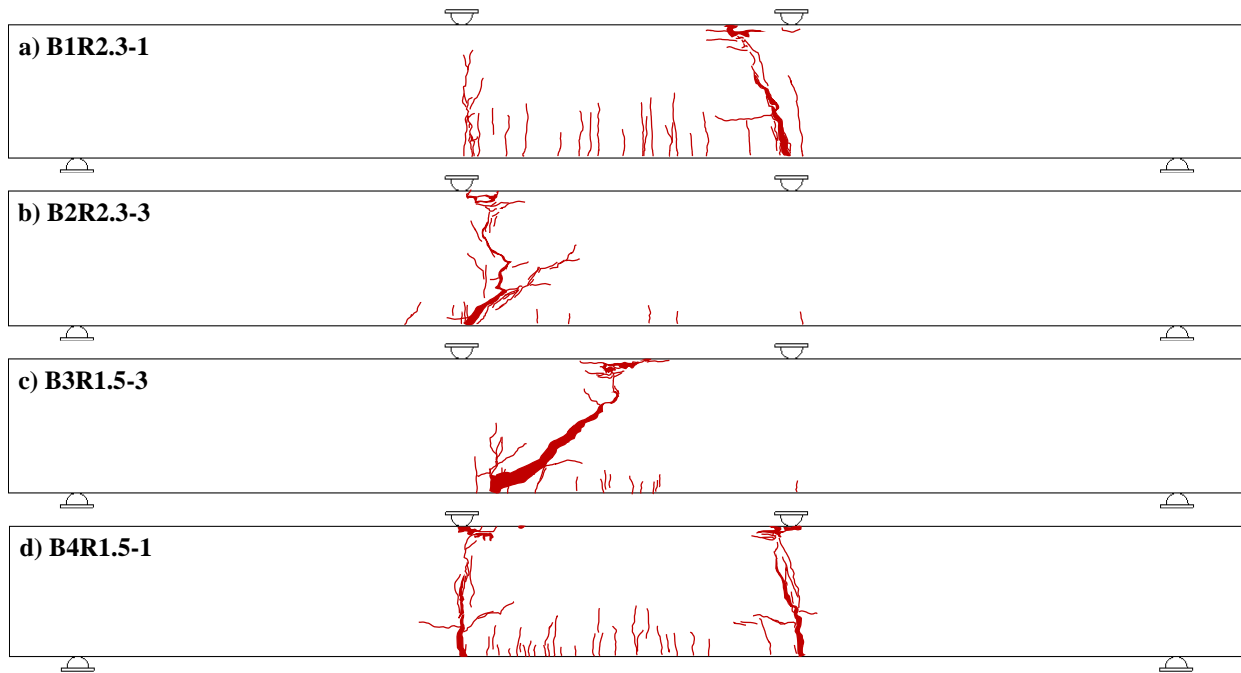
Crack Distribution for Beam Specimens a) B1R2.3-1, b) B2R2.3-3, c) B3R1.5-3, and d) B4R1.5-1
